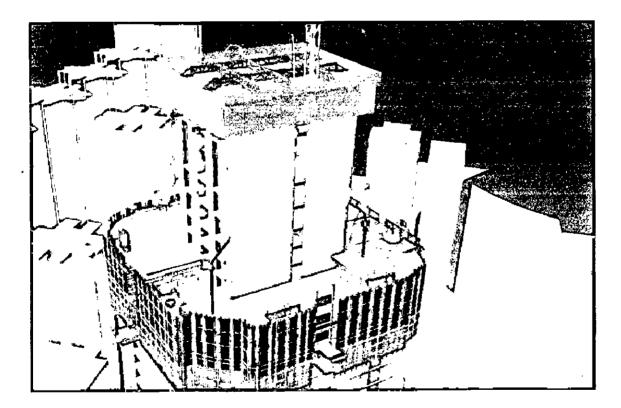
(e): Construction Sequencing Model (Gammon Construction Ltd, HK)
